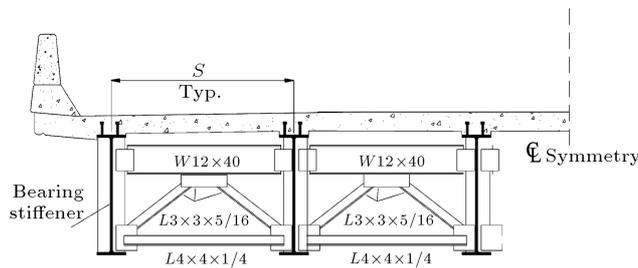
Cross-section of a typical skewed slab-girder bridge.
